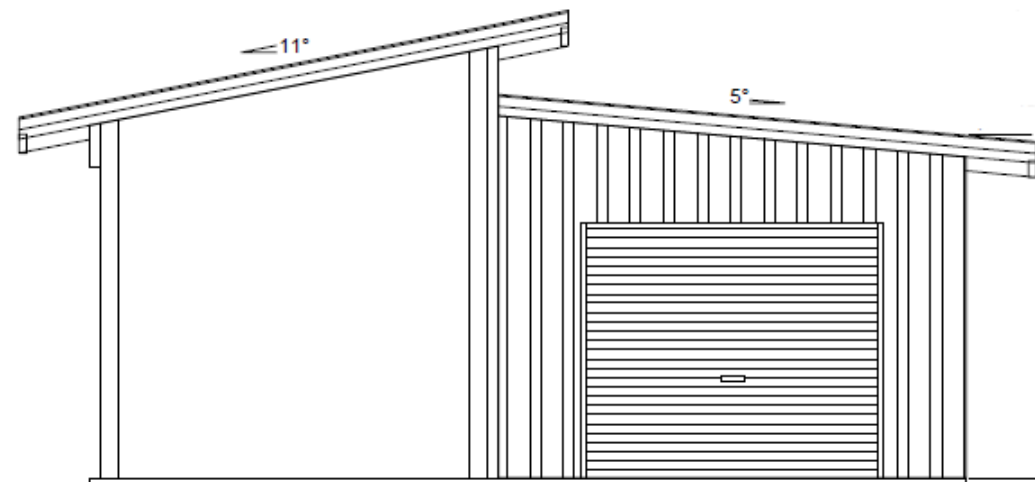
Endwall Exterior Elevation – Rivera Barns and Garages
